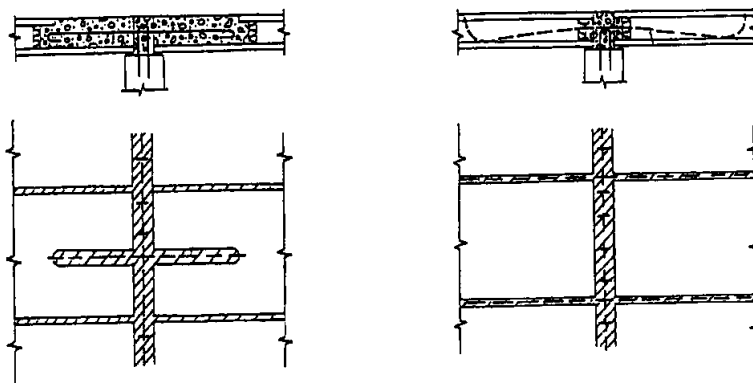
Connecting bars in open cores Fig. 2 : Connecting bars in longitudinal joints
